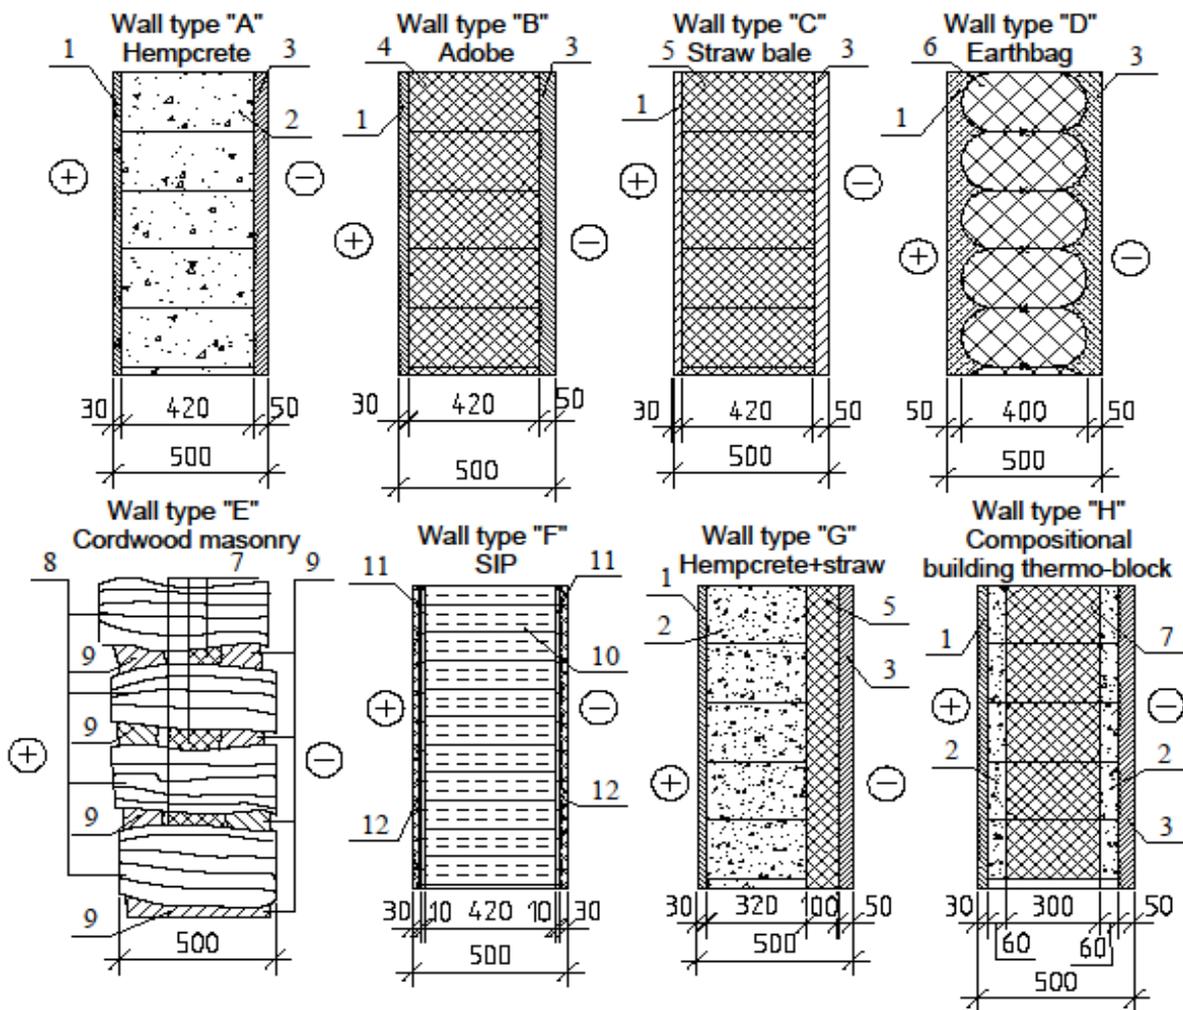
Cross-section of investigated wall assemblies (1 - internal lime-sand plaster, 2 - hempcrete, 3 - external lime-sand plaster, 4 - adobe, 5 - strawbale panel, 6 - earthbag, 7 - chopped straw as an insulator, 8 - cordwood, 9 - lime-sand plaster, 10 - eco fibre, 11 - lime-sand plaster, 12 - plywood)
